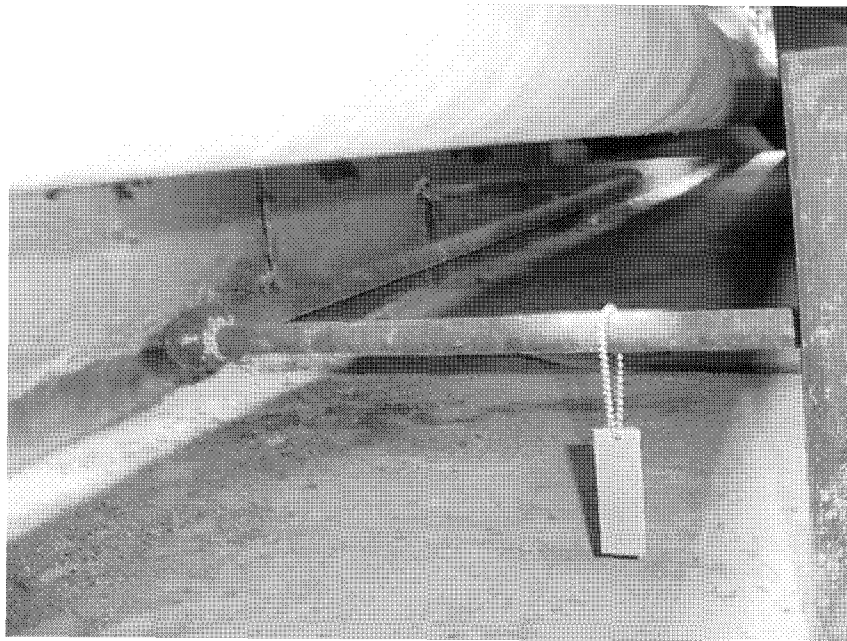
Steam trap (Discharge 2) existing out through the utility tunnel wall.
